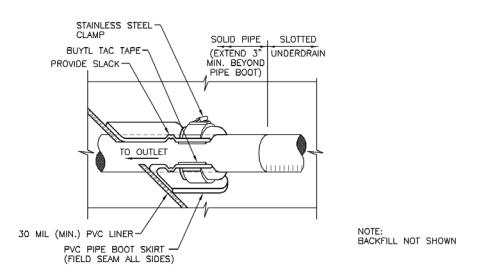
Geomembrane Liner/Underdrain Penetration Detail
